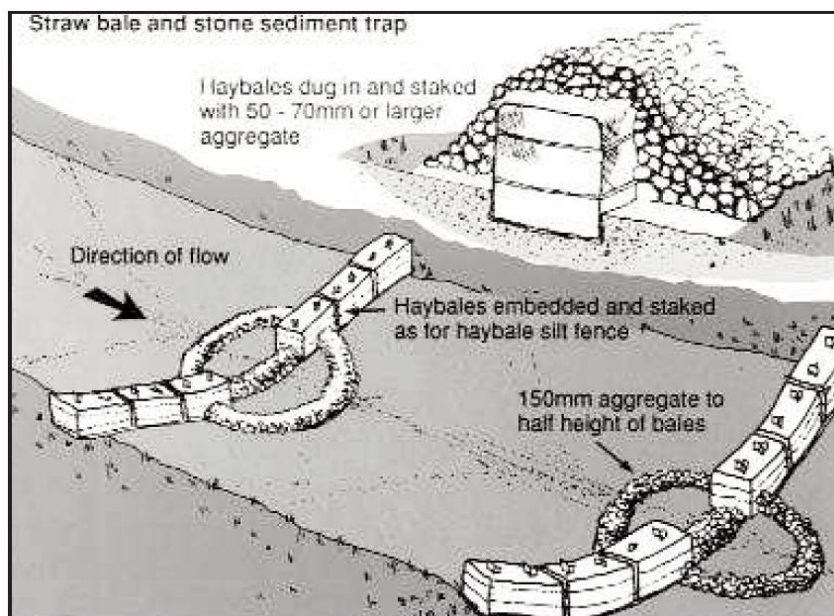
Typical layout of check Dams (Source; CIRIA, 2006¹⁰)
